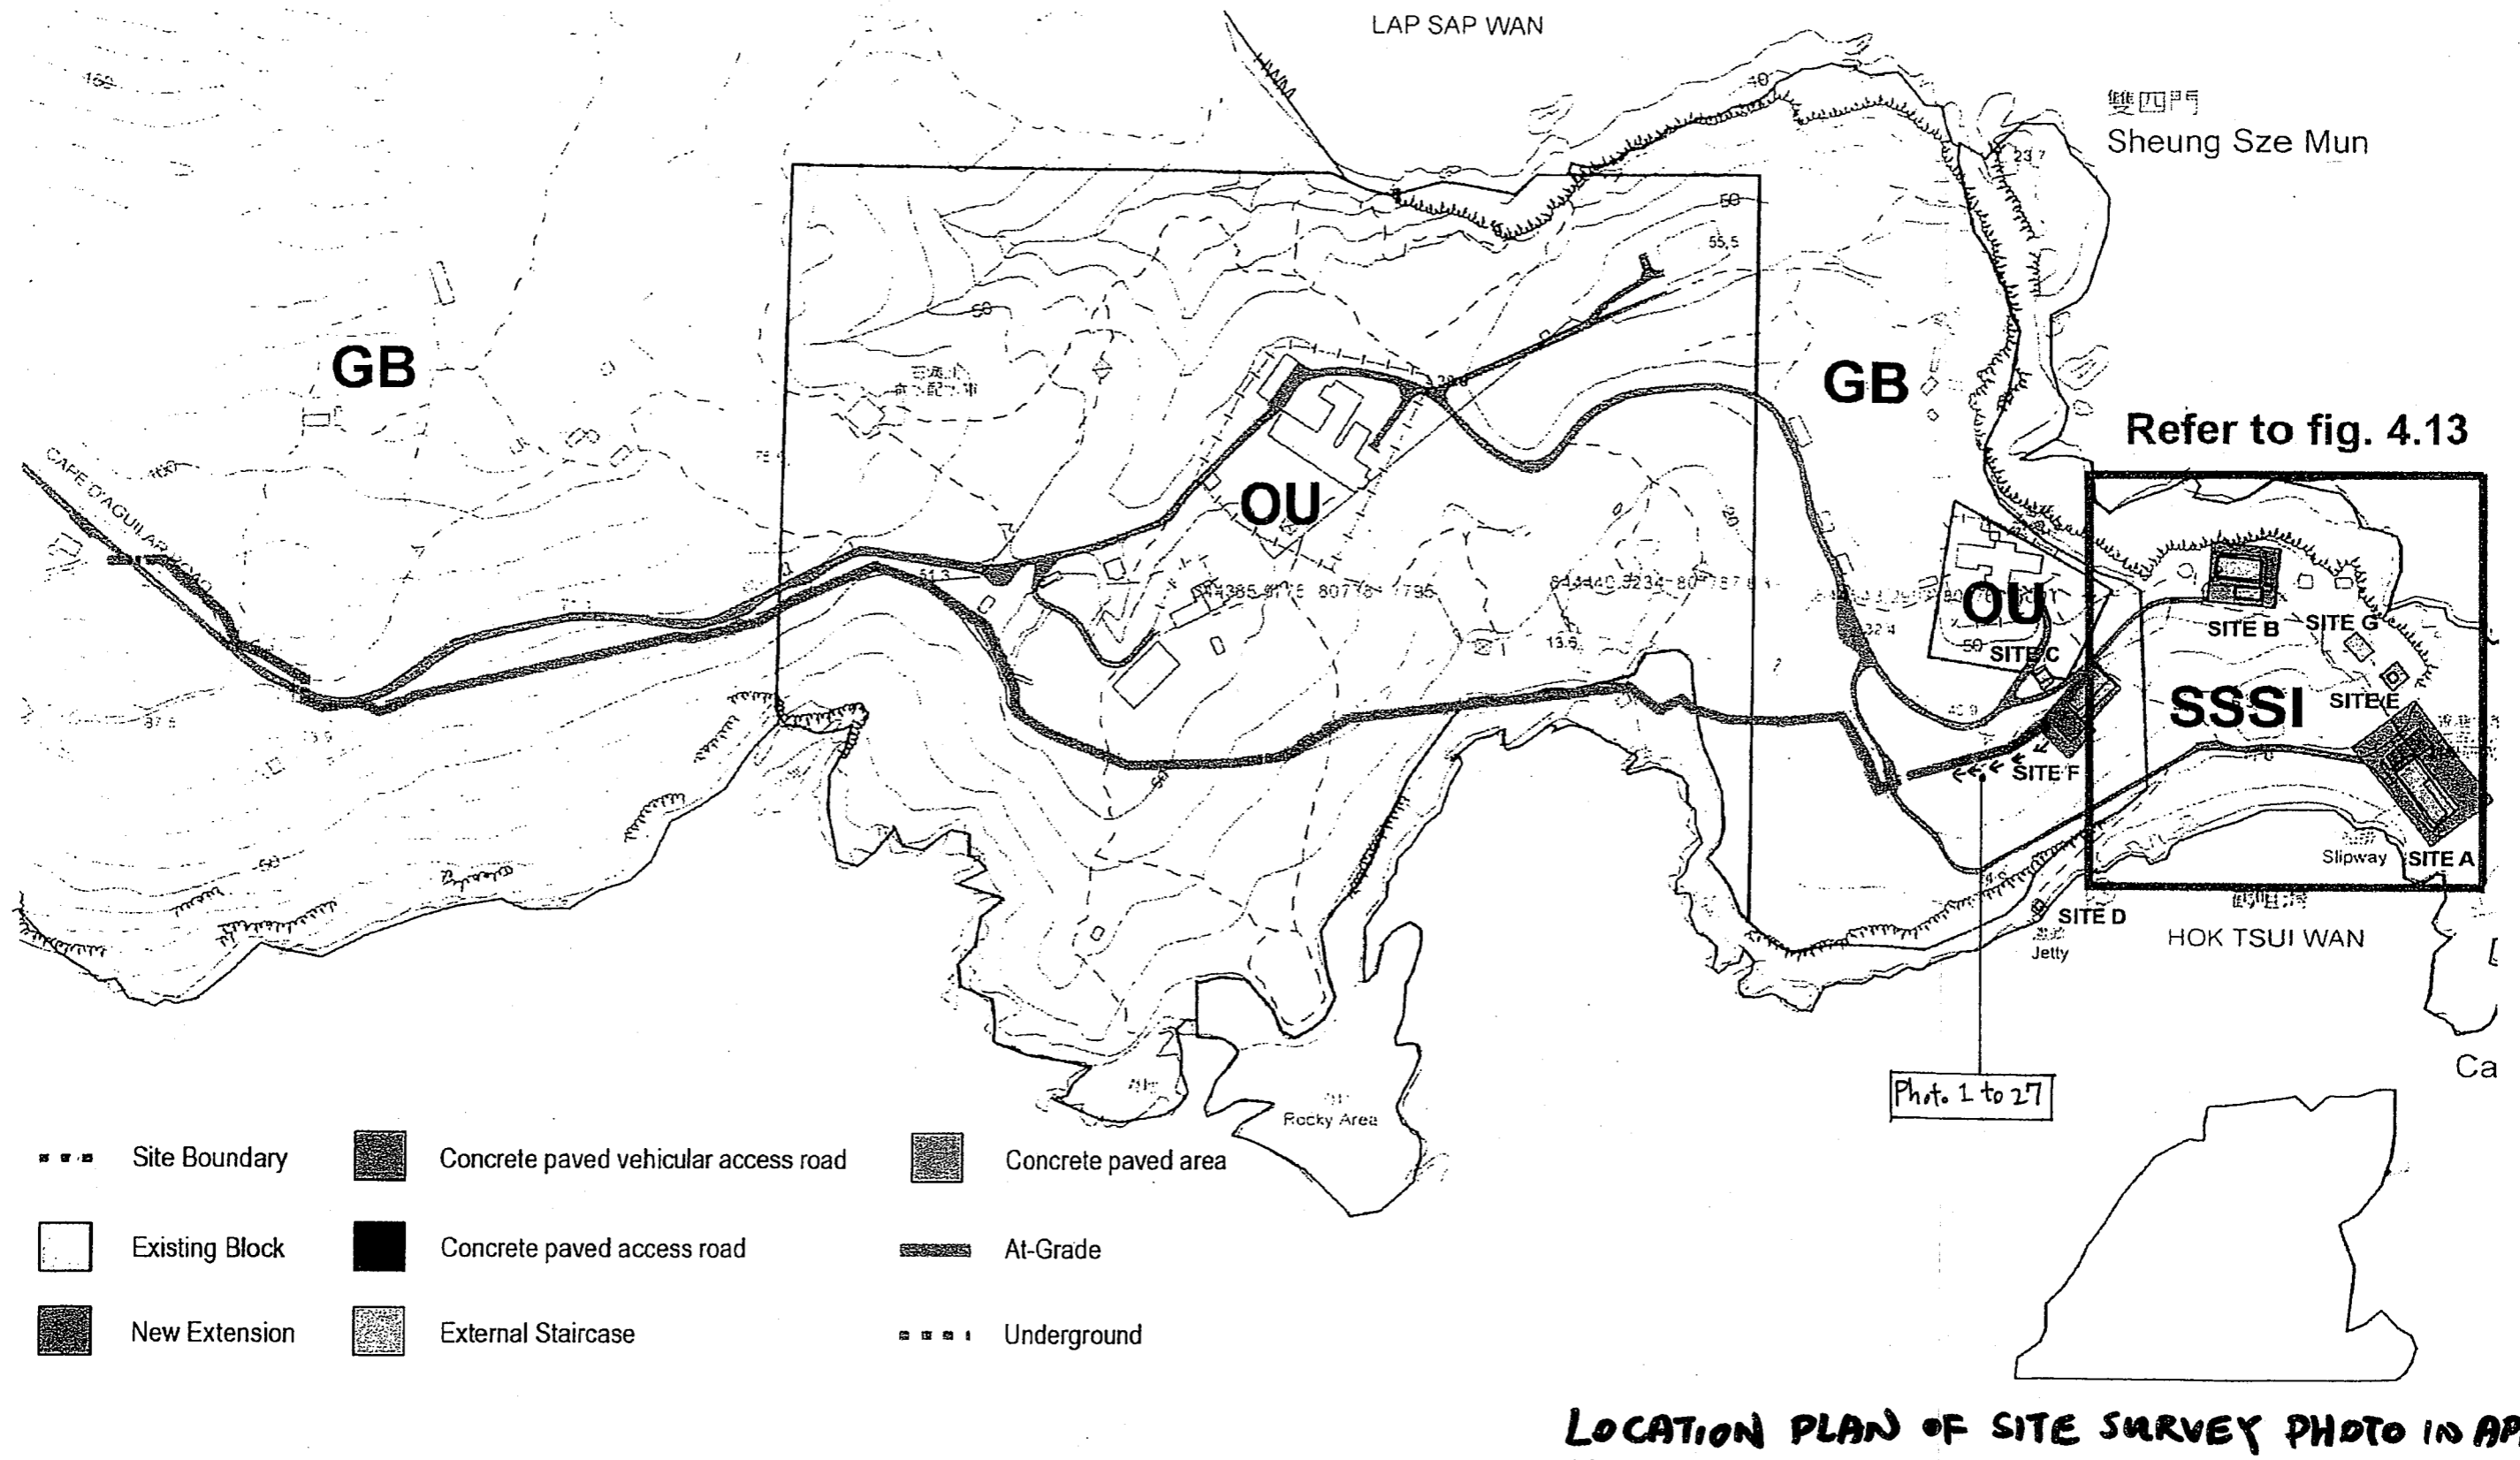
Layout Plan Describing the Proposed At-grade and Underneath Concrete Paved Area Arrangement of Fire Services Water Pipe with Alignment
